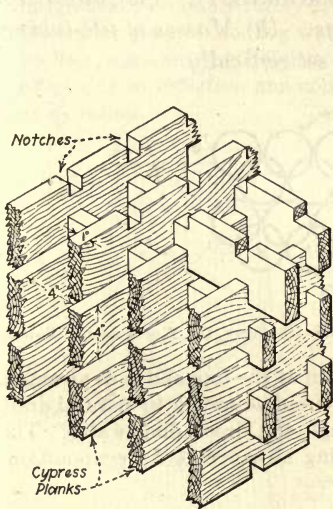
Cypress Board Checker Work For Cooling Towers.
